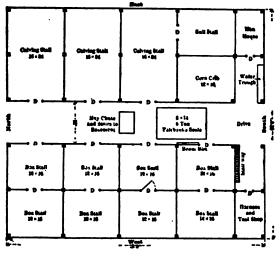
KENTUCKY FARM BARN (FLOOR PLAN).
